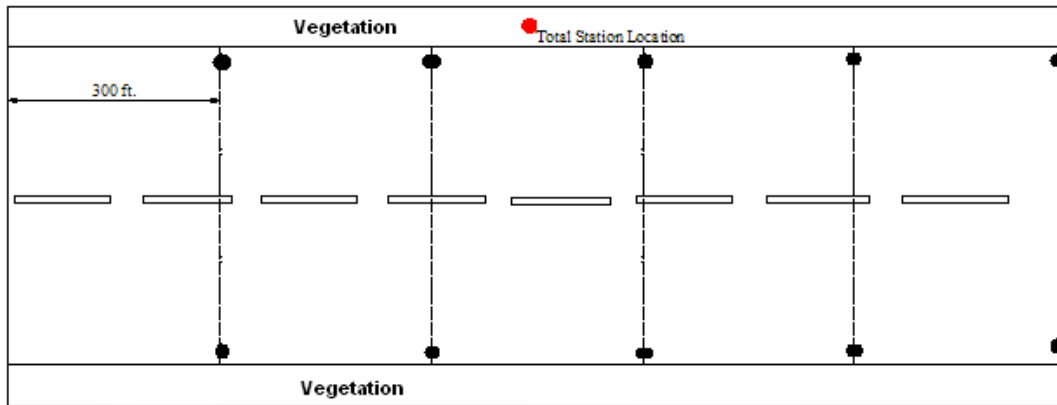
Plan Views of Elevation Survey Points at Southmoor
